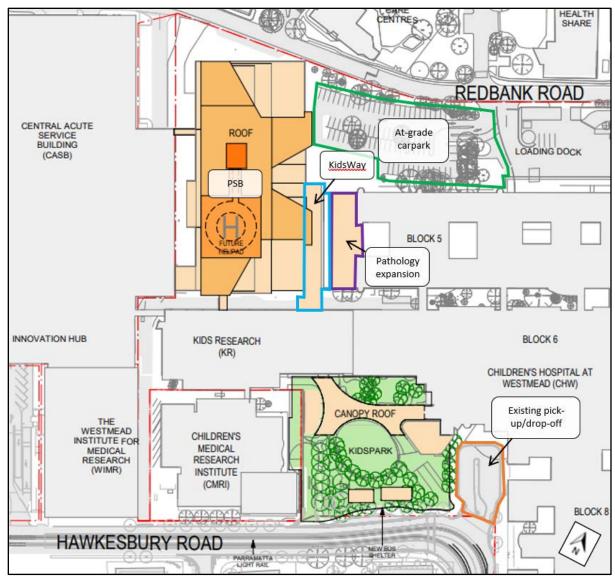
| Proposed site plan (Source: Applicant's RtS)
